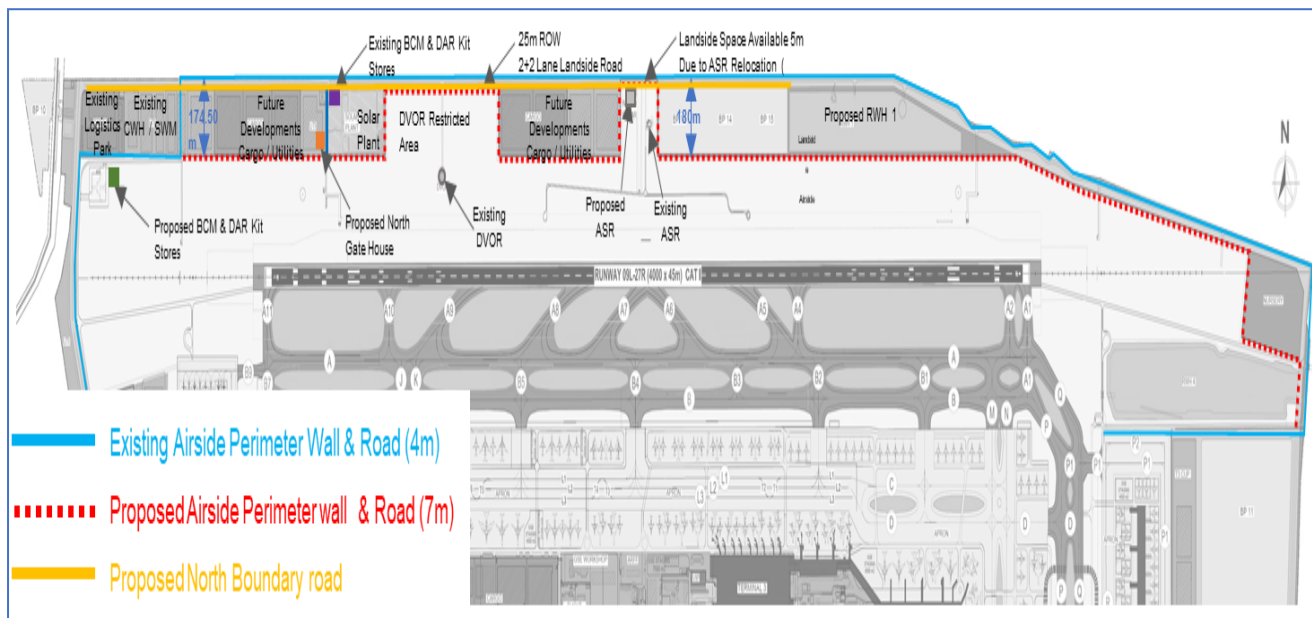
Proposed North Airside Perimeter Wall and Perimeter Road
